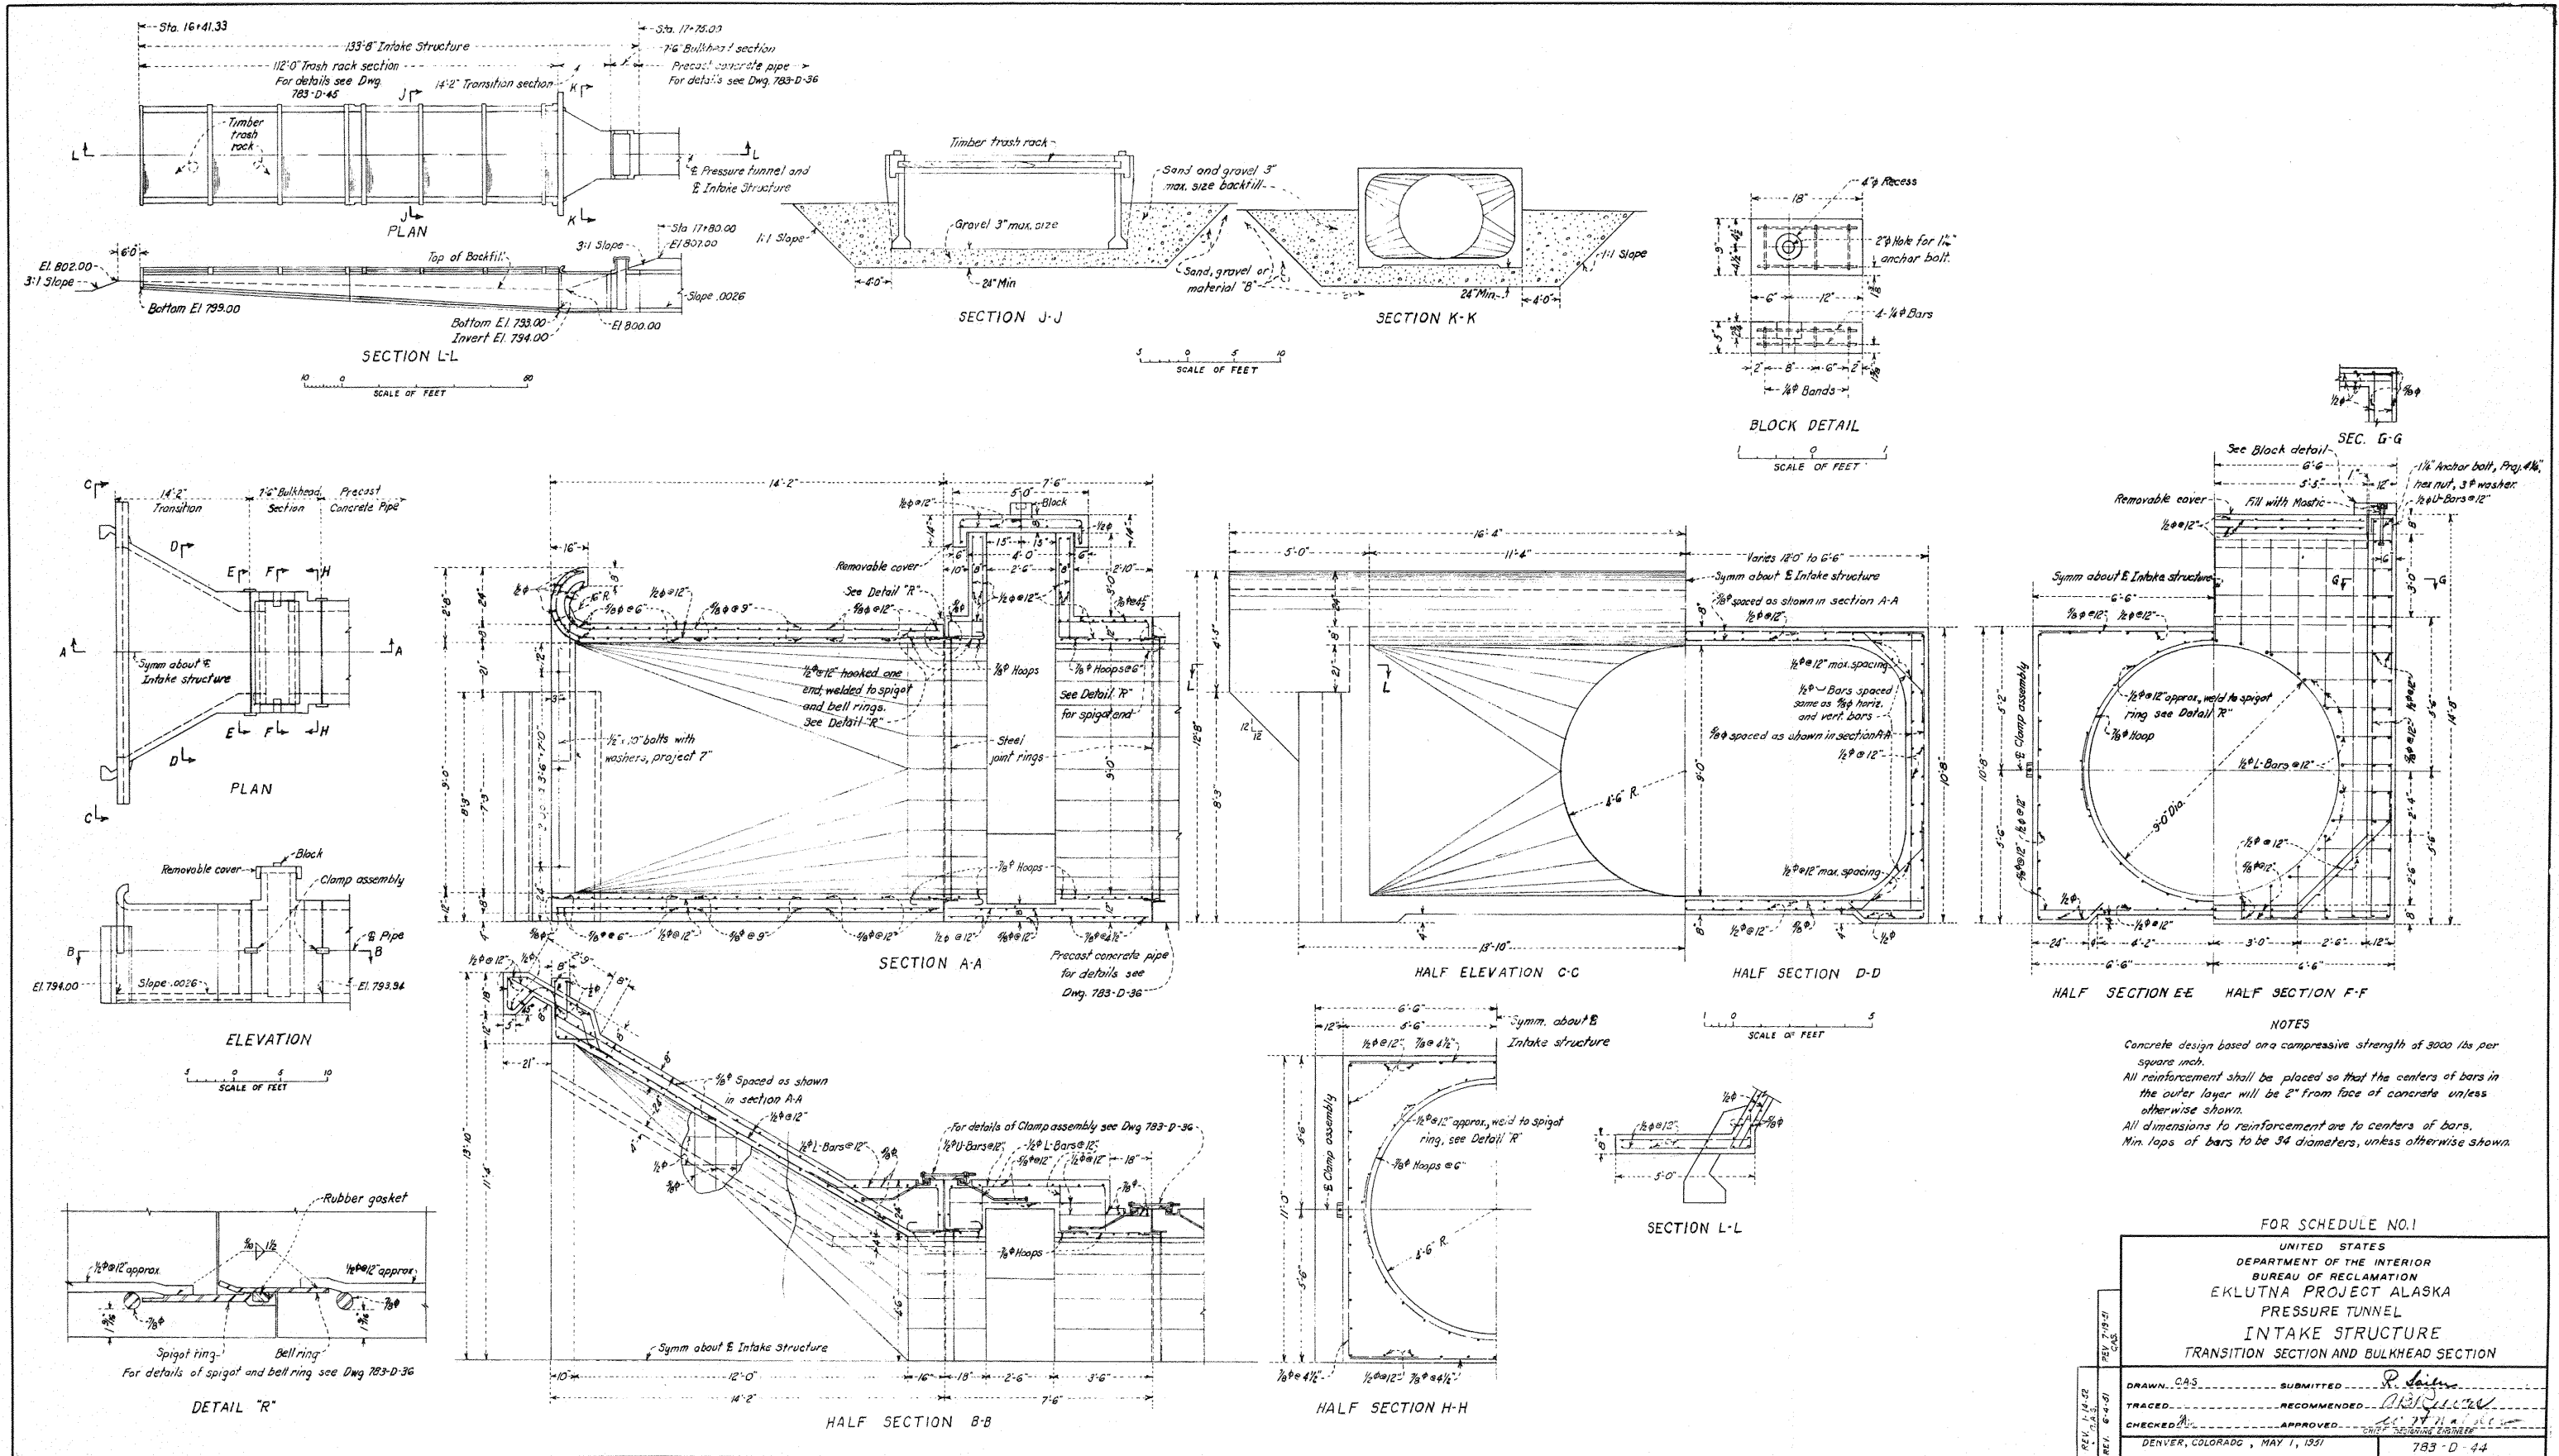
Transition section and bulkhead section for pressure tunnel intake structure.
